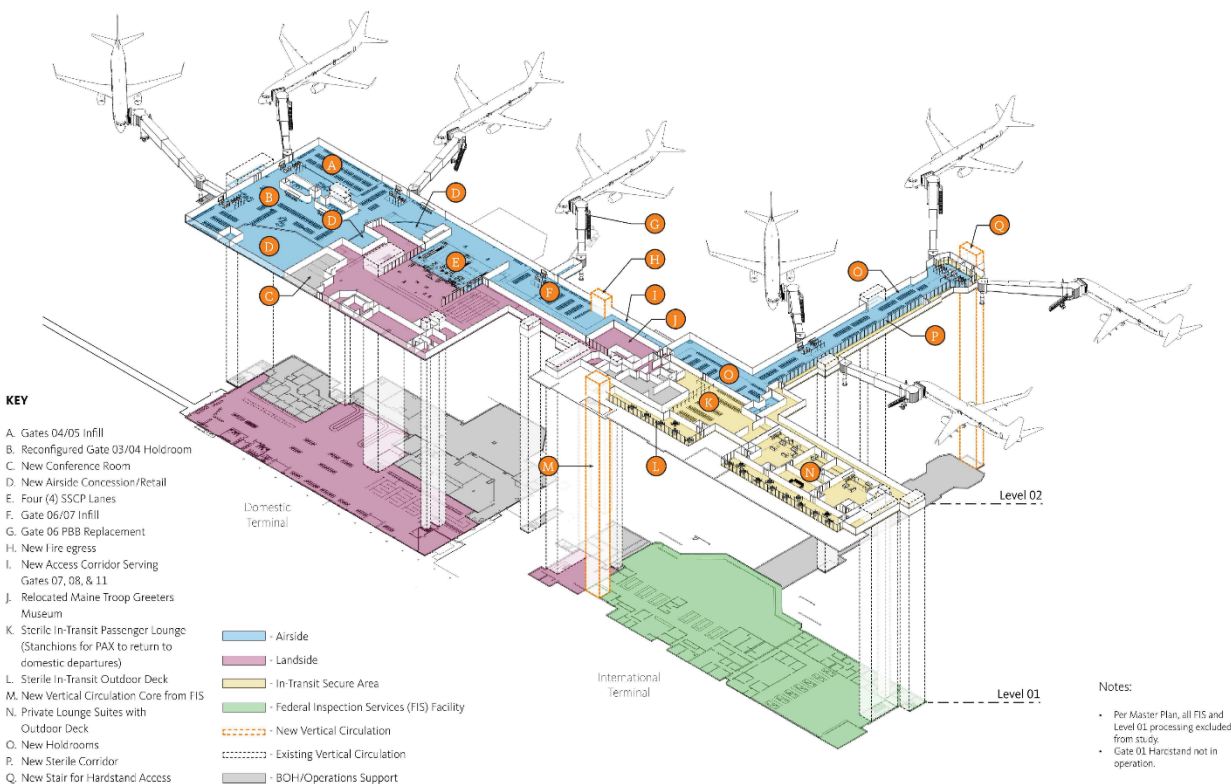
Existing Domestic and International Terminals: Exploded Axonometric View
